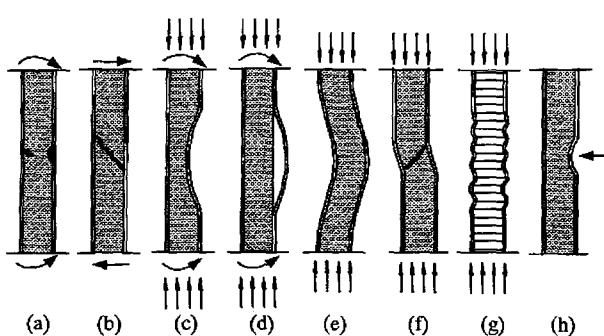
Potential Failure Modes of Sandwich Panels (100), (a) Face yielding/fracture, (b) Core shear failure, (c-d) Face wrinkling, (e) Buckling, (f) Shear crimping, (g) Face dimpling, (h) Local indentation.
